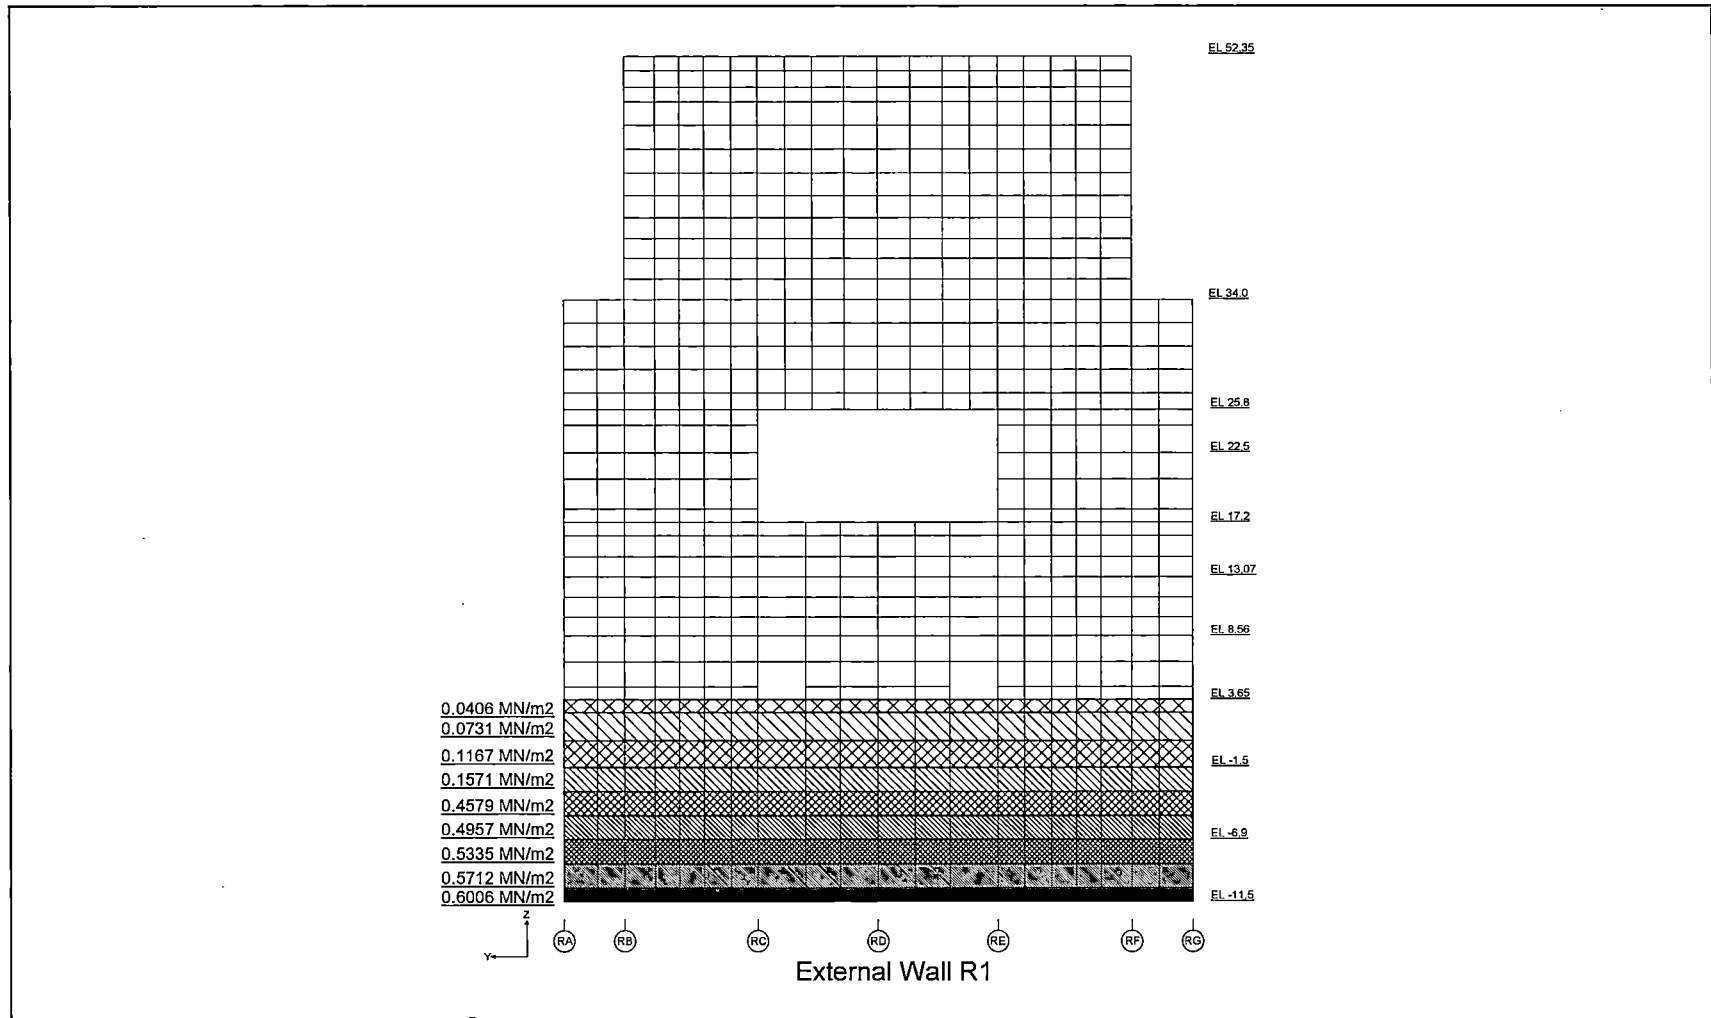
Lateral Soil Pressure Load at Rest (R1 External Wall)
